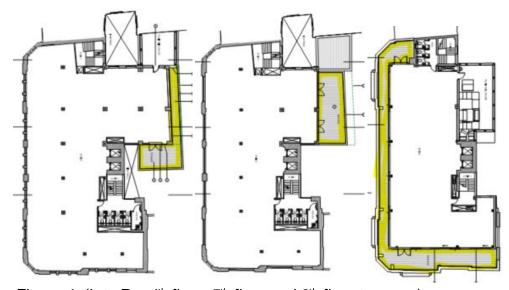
(L to R – 4<sup>th</sup> floor, 5<sup>th</sup> floor and 6<sup>th</sup> floor terraces)
